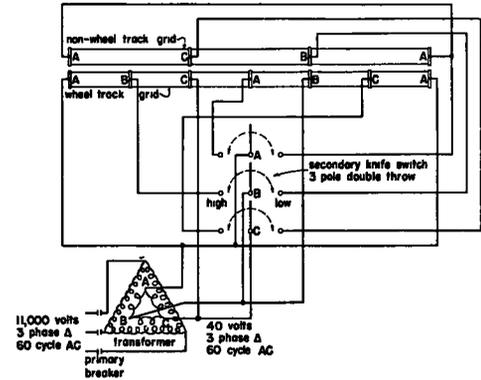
Schematic Wiring Diagram of Salem Bridge Heating Installation
